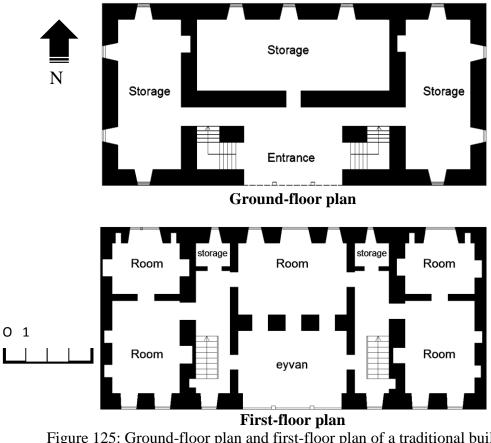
Ground-floor plan and first-floor plan of a traditional building in Urumye (Sartip M., 2009)
